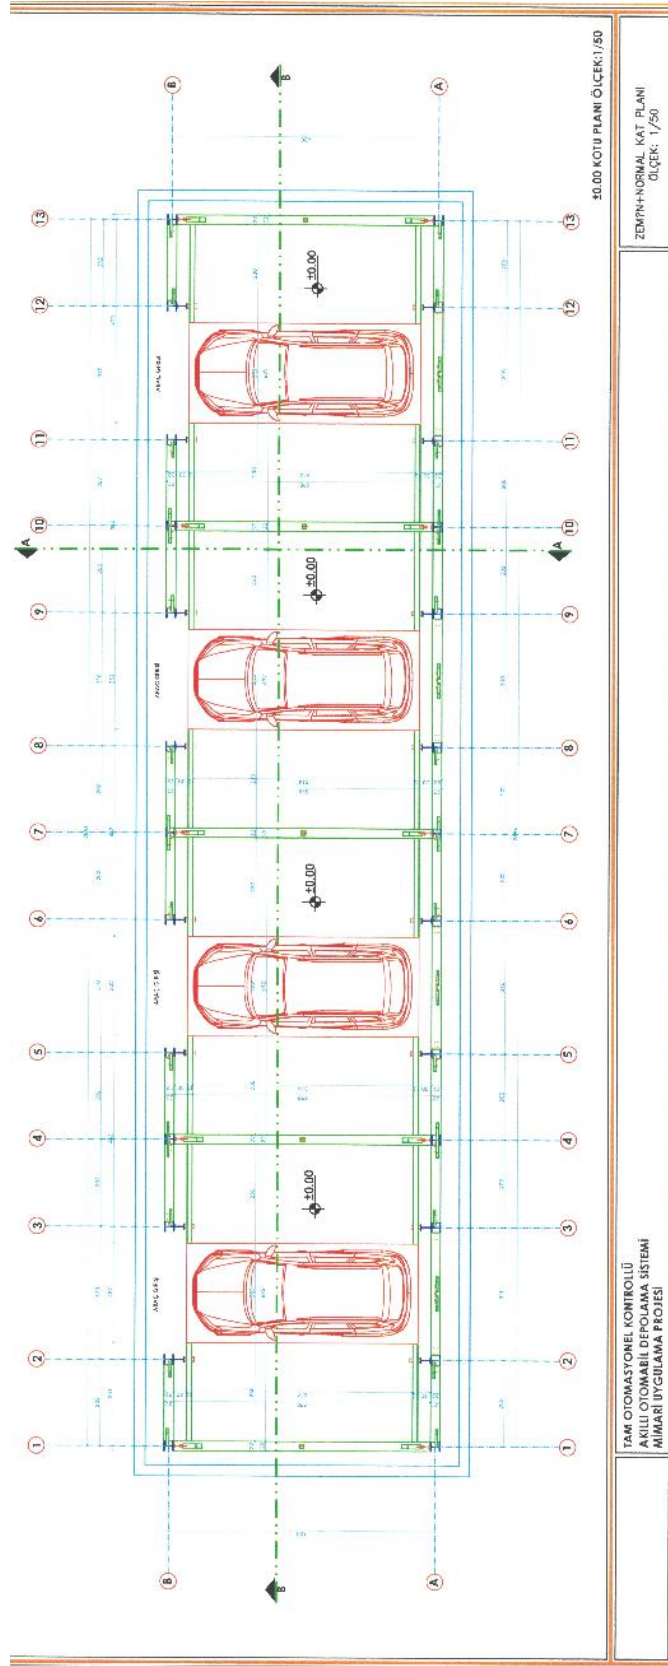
Balikesir Balpark 4x14 Tower Type AVPS plan view
